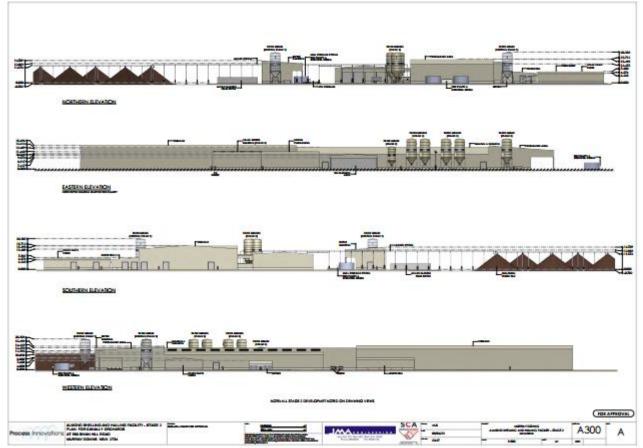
Proposed Elevation Plan (JMA Engineering, 2024)
